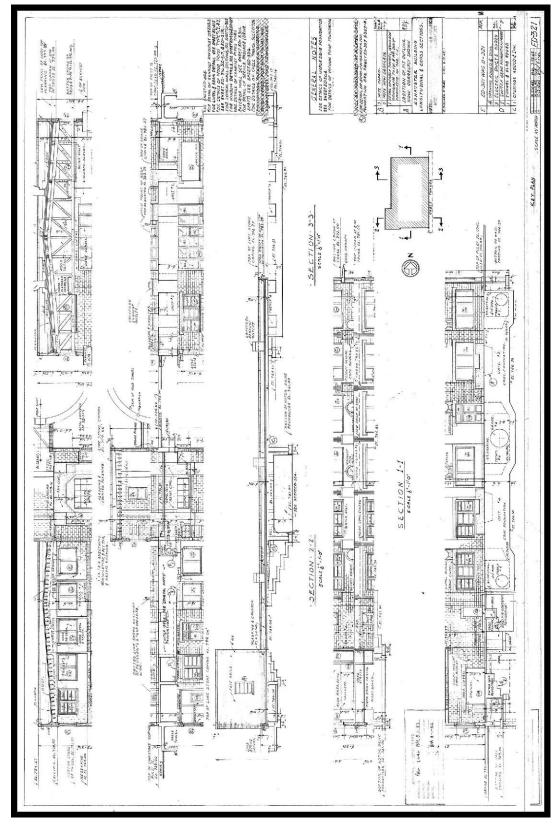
Elevation drawing of the Exhauster Building, 1942 (OH_Cuyahoga_AWT-Support_045).
